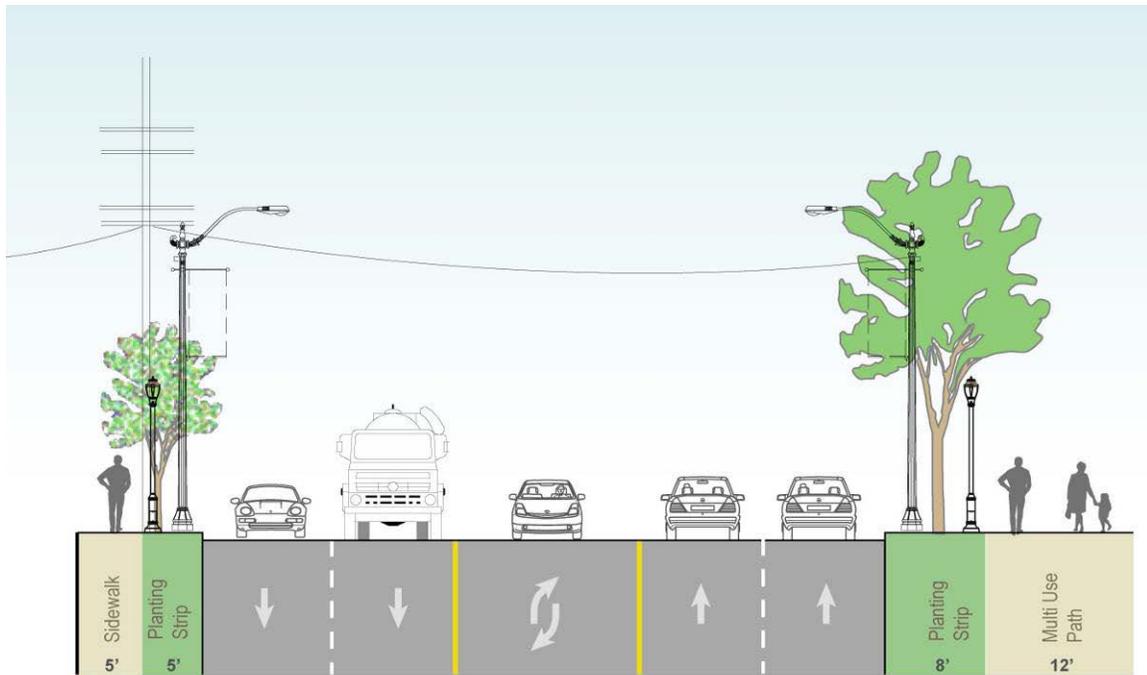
Proposed cross section for East Market Street with street lights, planting strip, and a multi-use path on the north side of the street.
